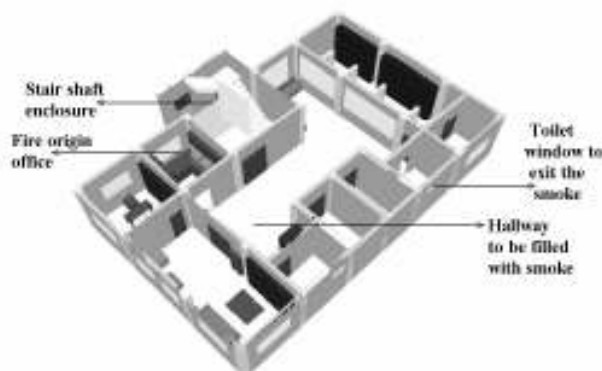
The building subject of the fire modeling. Plan of the first floor (in section)
